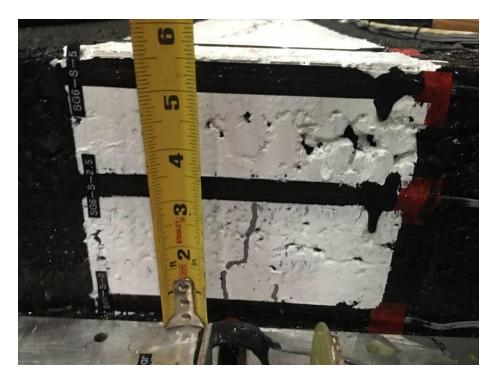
Bottom-up crack at SG6-S-0 3 inch long
